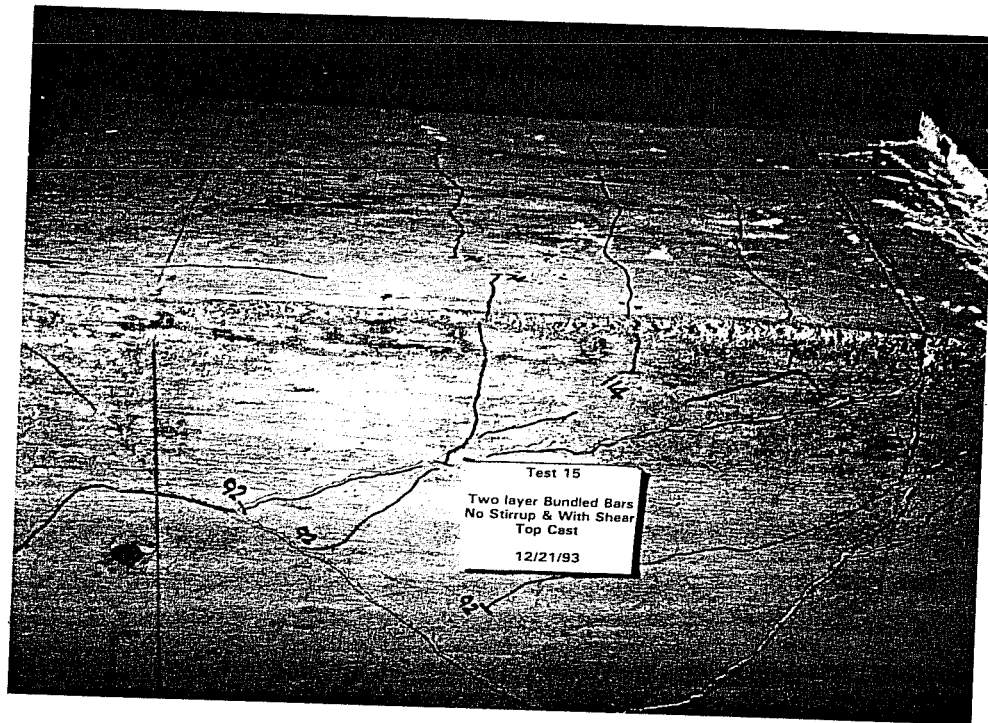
Failure mode for two layers of bundled bars without transverse reinforcement-- shear in anchorage zone (Test 15 2-24-S-B)
